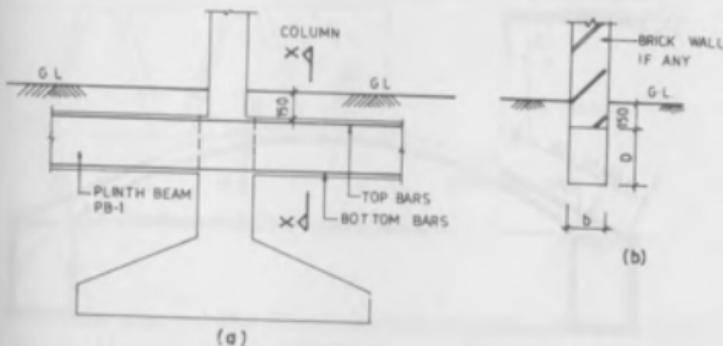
Detailing of plinth beam PB-1. (a) Elevation of plinth beam PB-1; (b) Section X-X.
